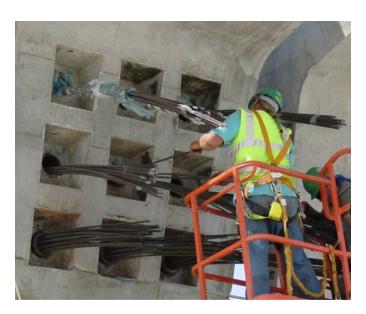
Precast concrete bridge segment with PT tubes and strands shown
